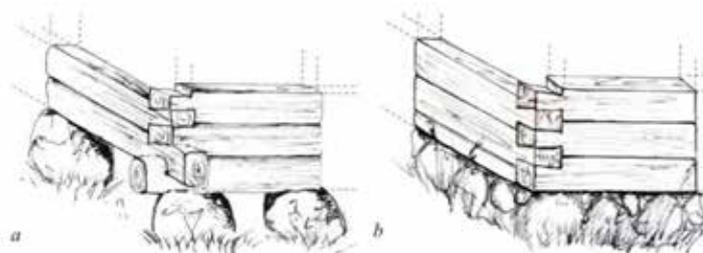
Ground works supporting wooden structures, were built using large and compact blocks of stone (a) or a ballast of smaller stones (b).
